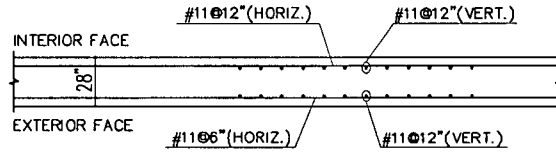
Typical Reinforcement in North Exterior Wall of Spent Fuel Pit – SECTION 3
